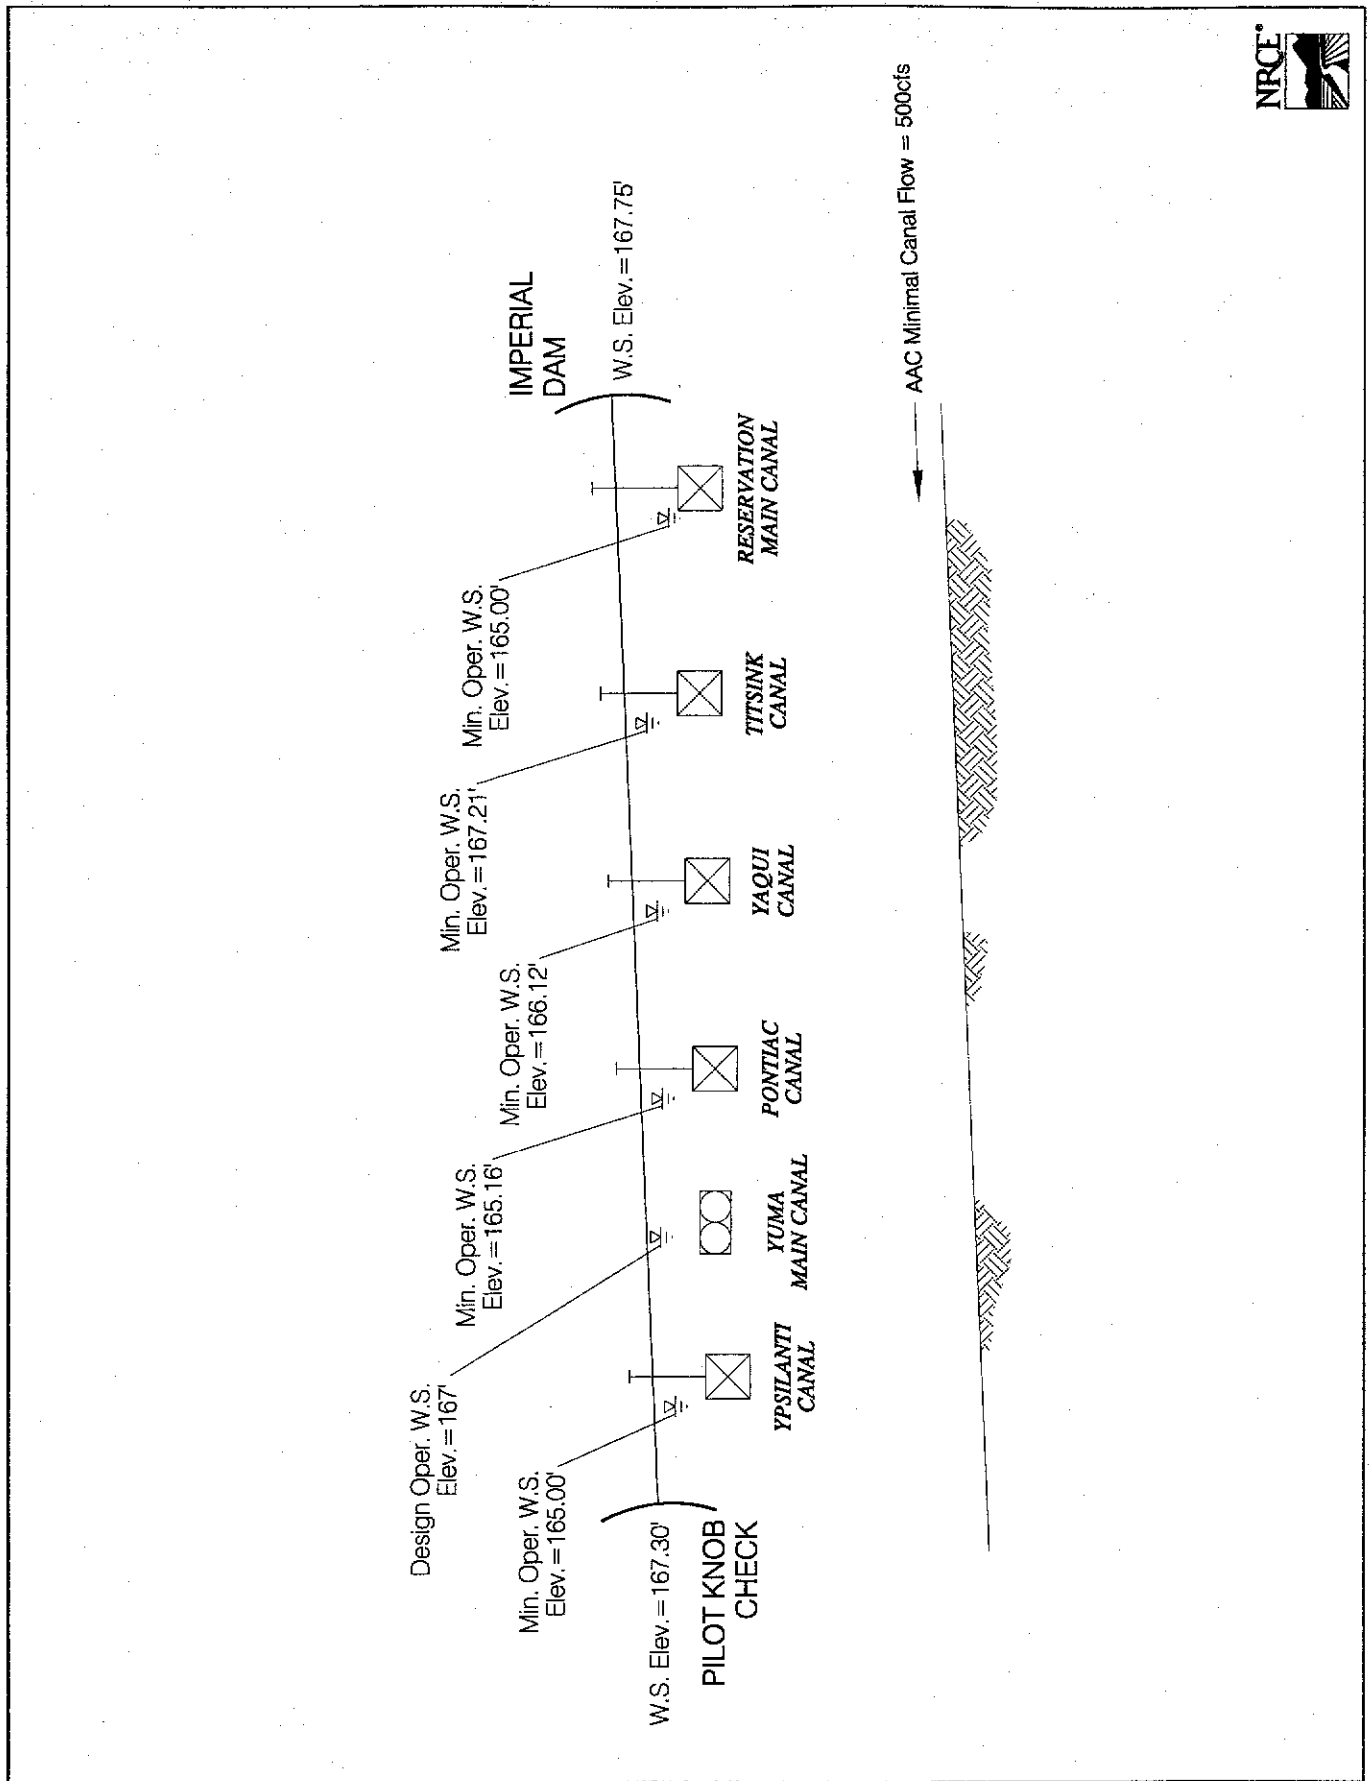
Minimum Operating Water Surface Elevation for the Turnouts on the AAC and the Water Surface Elevations of the AAC at Imperial Dam and Pilot Knob Check Structure at Minimum Flow.
